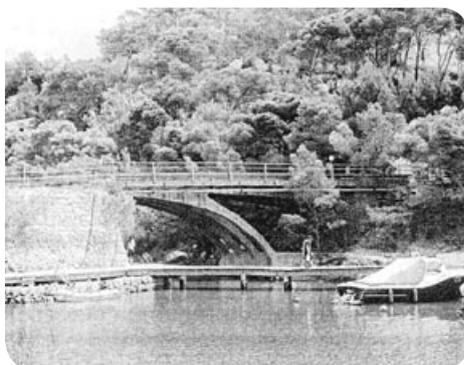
An old concrete bridge (left), which will be replaced by a new 2205 bridge (below) in Menorca.
